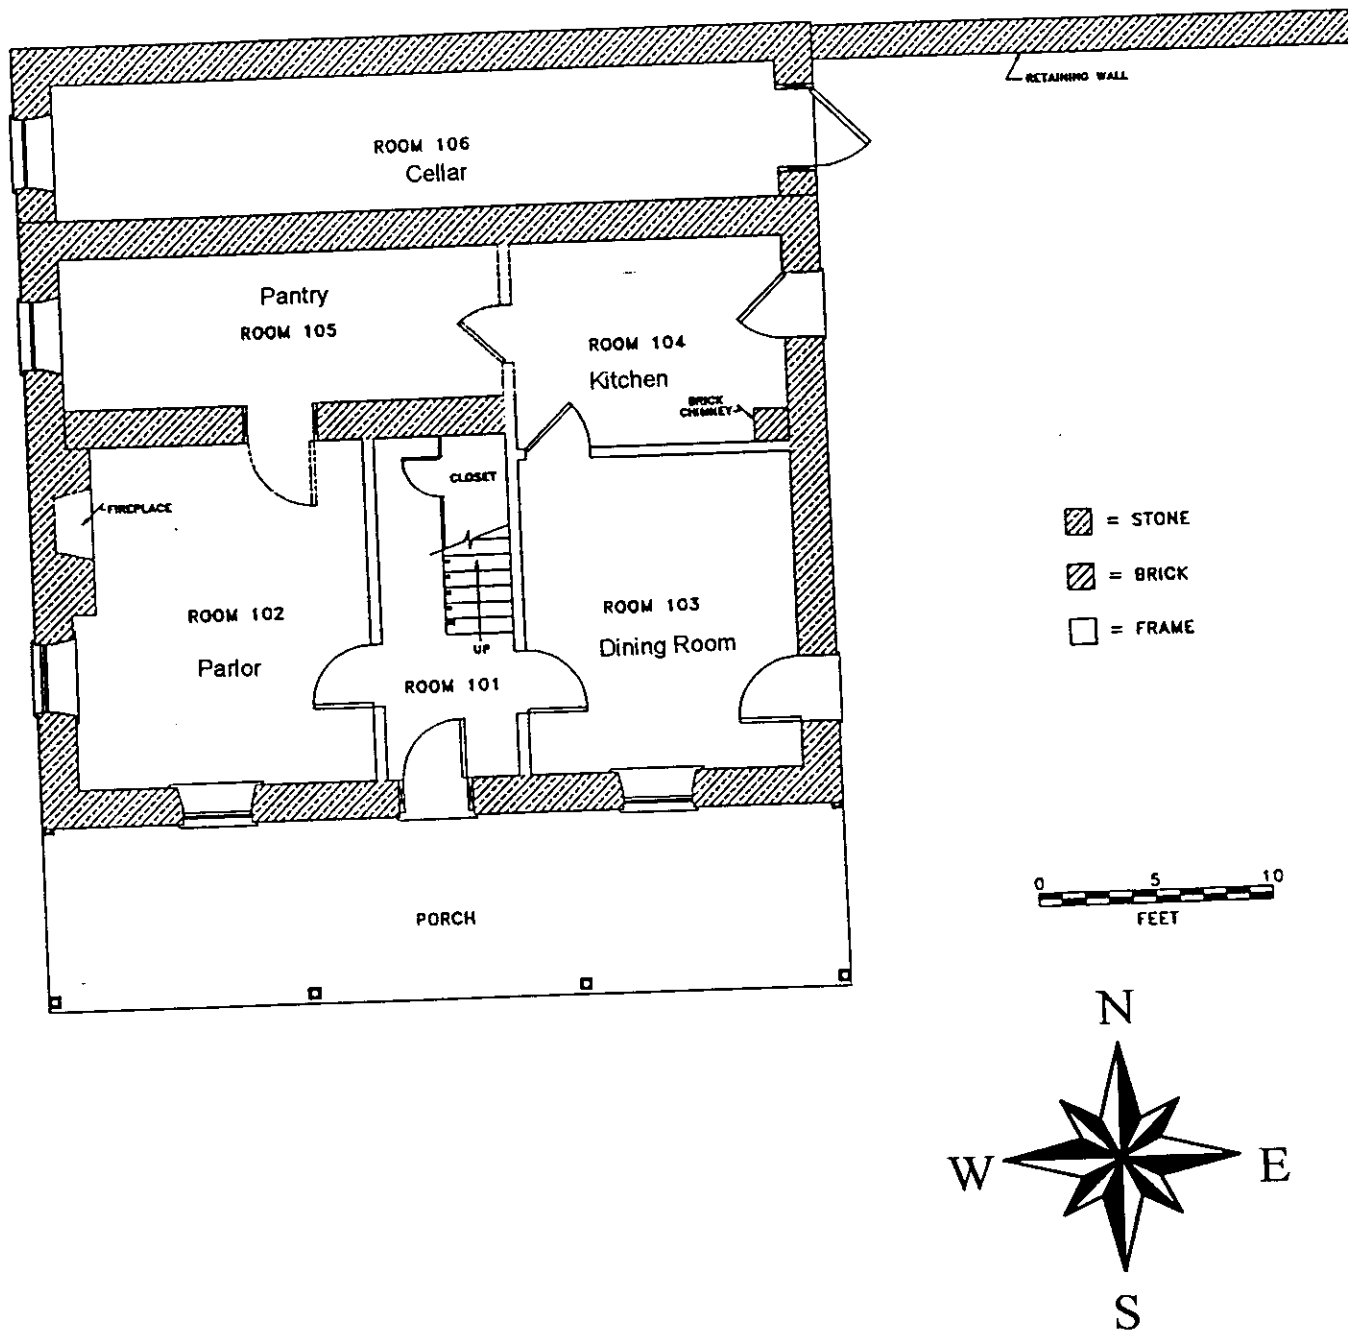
Ground floor plan of the house at the Smith/Duncan House, circa 1876
